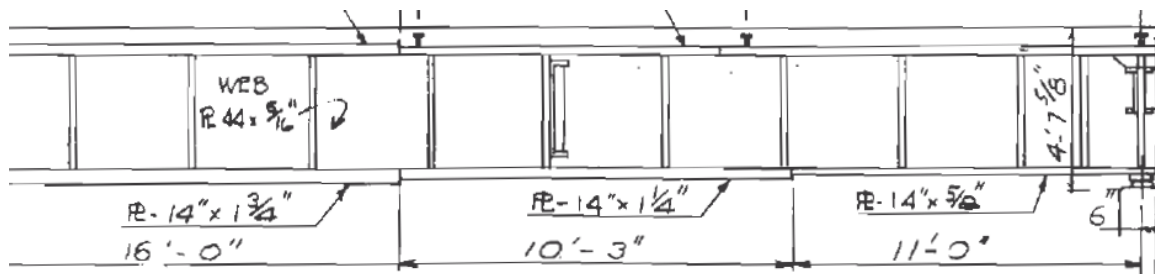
Plate girders in construction documents for bridge B-16-FM (courtesy CDOT)
